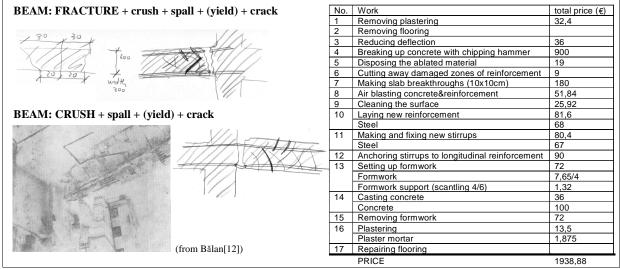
Damage image, reparation approach and device directory for repairing severe beam damage (after Bostenaru[4])
